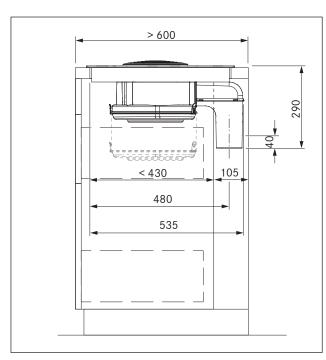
Installation dimensions for exhaust air, worktop depth 600 mm
